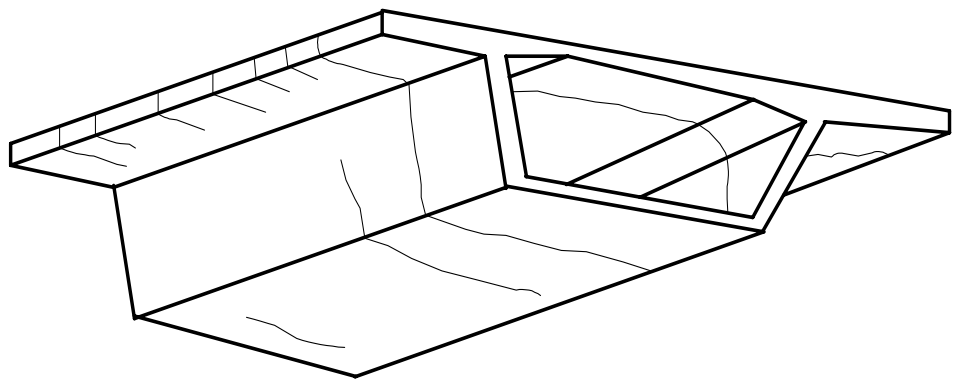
Box Girder Cracks Induced by Direct Tension
